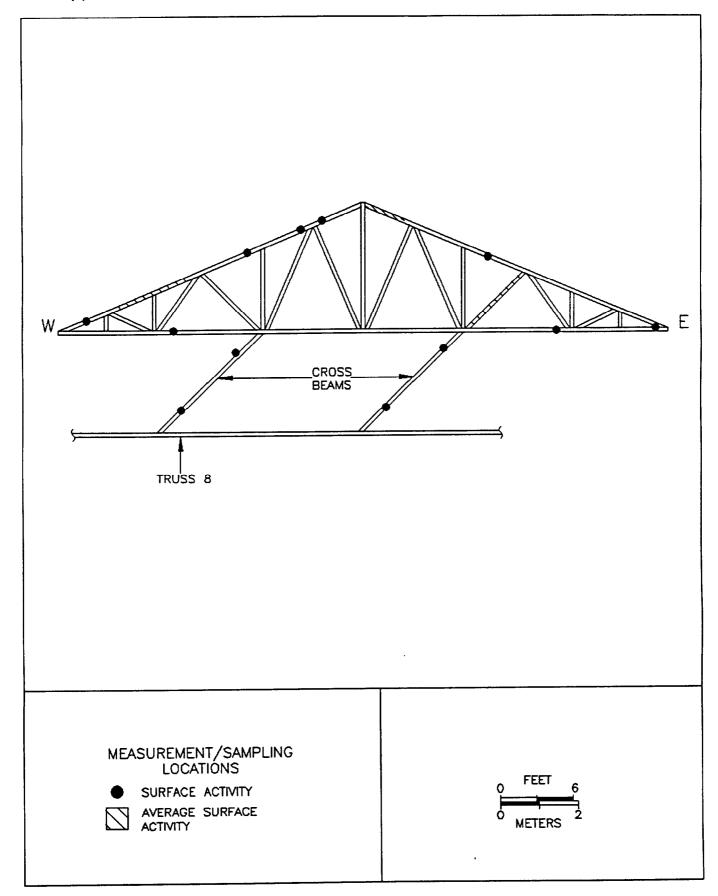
Building 3, Truss 9 — Measurement and Sampling Locations
